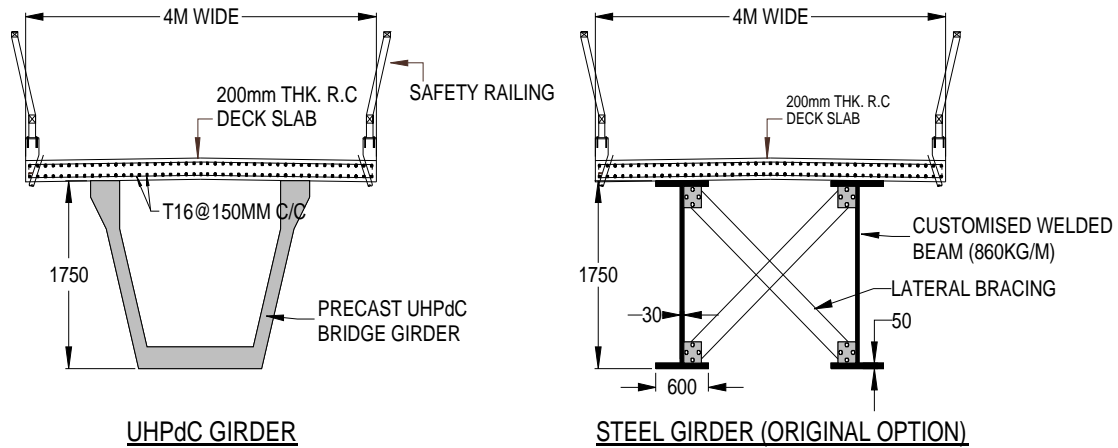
Comparison of UHPdC girder against steel girder composite bridge.
